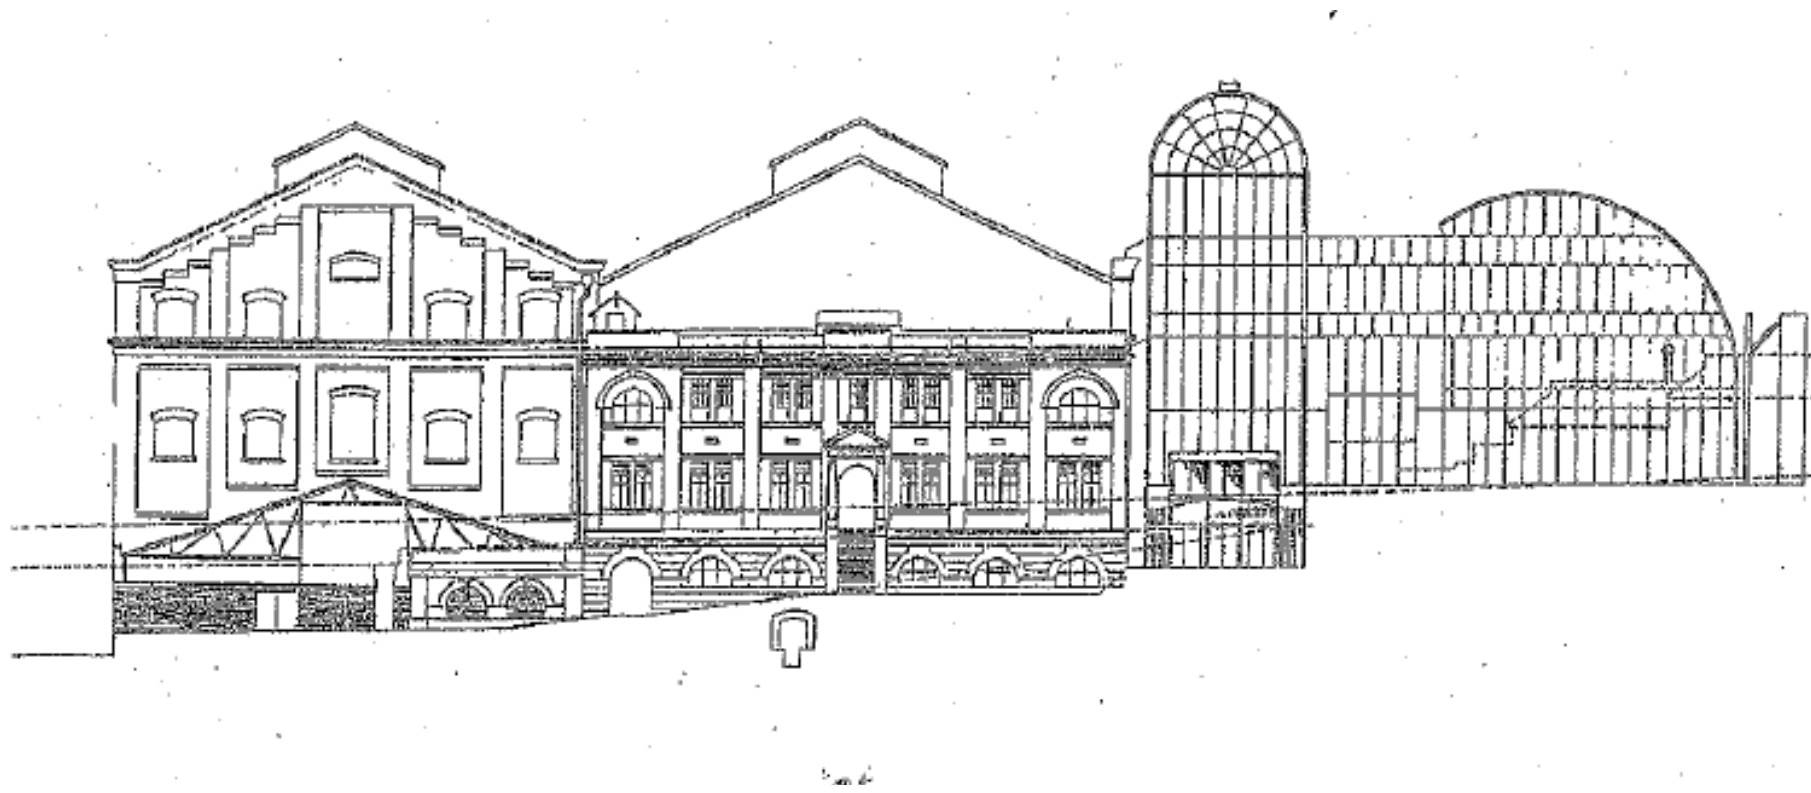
North elevation of the Powerhouse Museum in 1988 (Source: National Trust)
